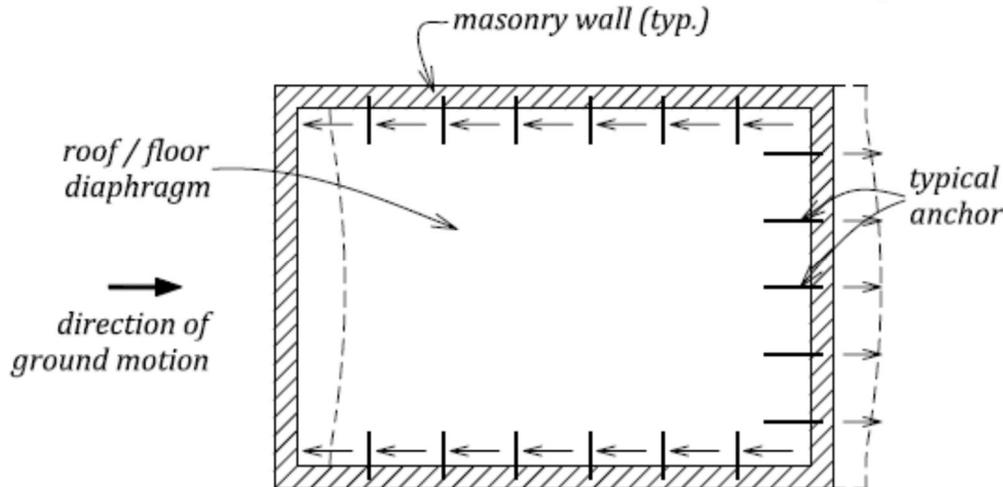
Tension and shear anchors at the wall-to-diaphragm connection.
